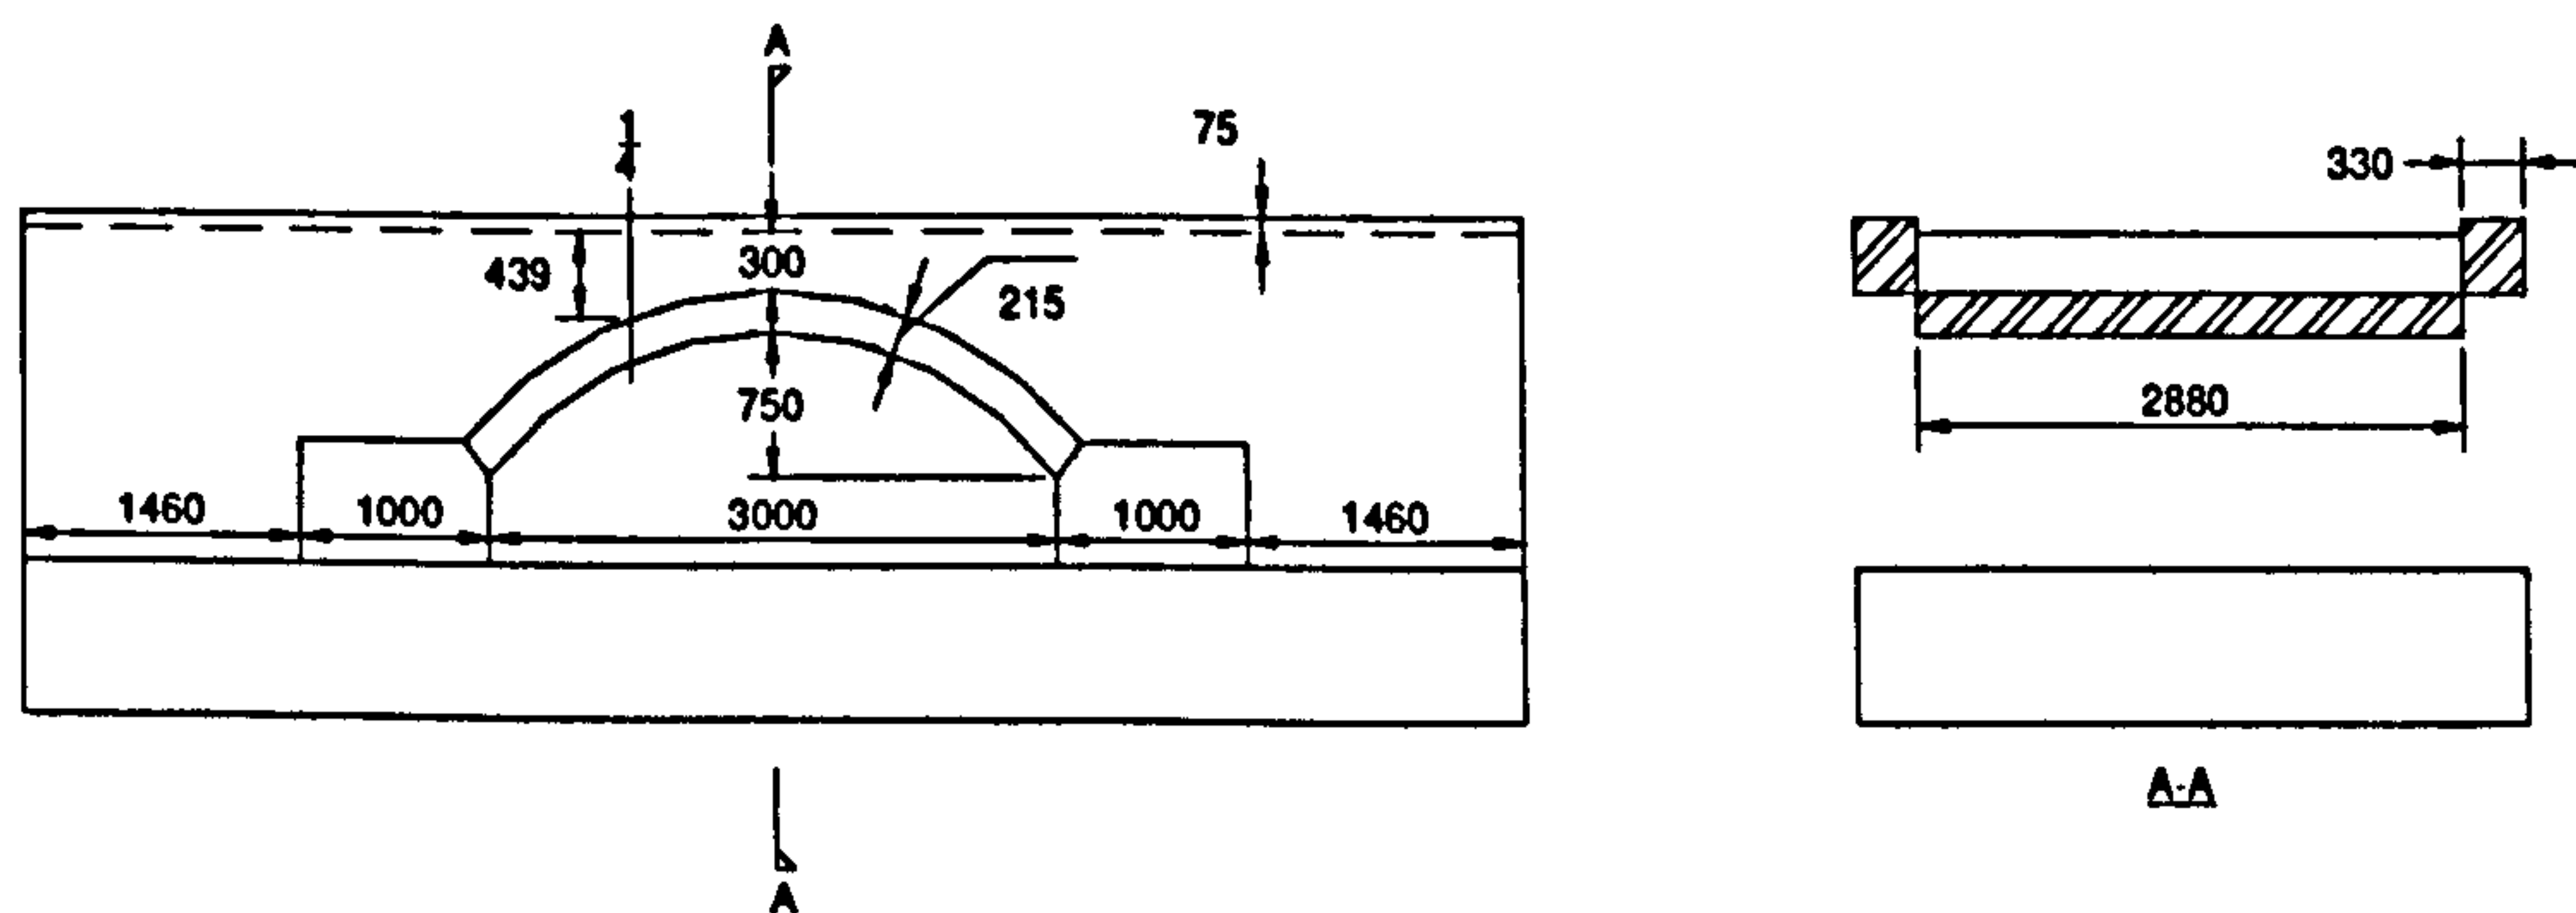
Bolton Institute tests: 3 m span bridge dimensions
